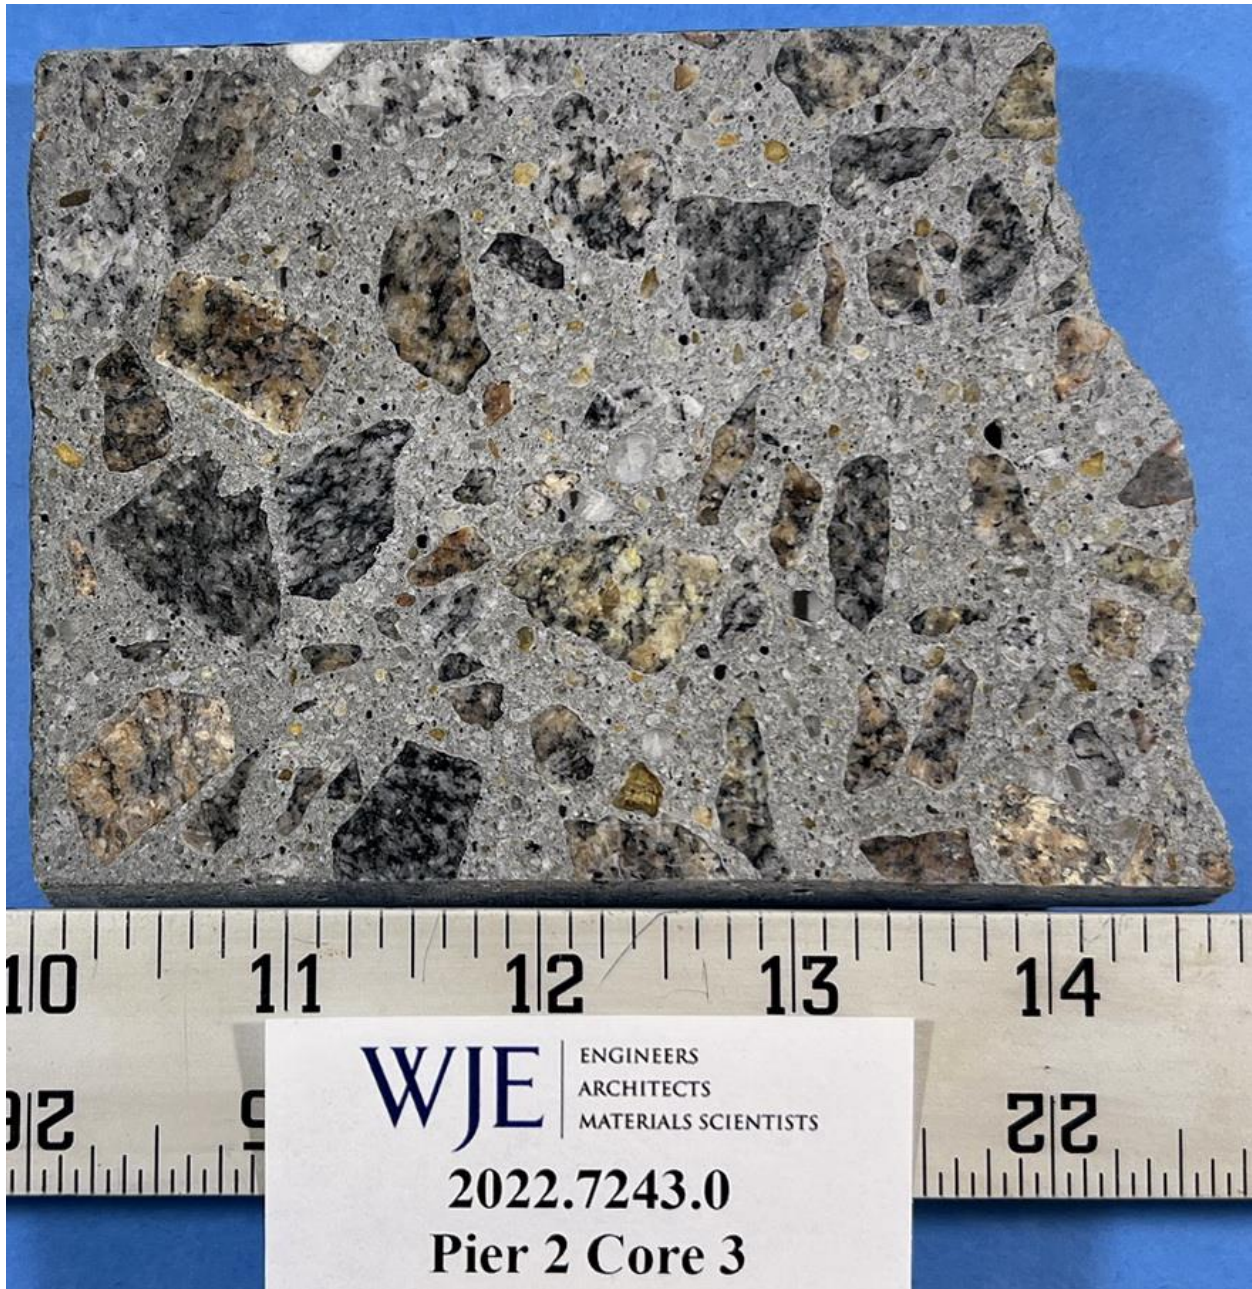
Core 3. Lapped cross section, with the exterior surface facing left.
